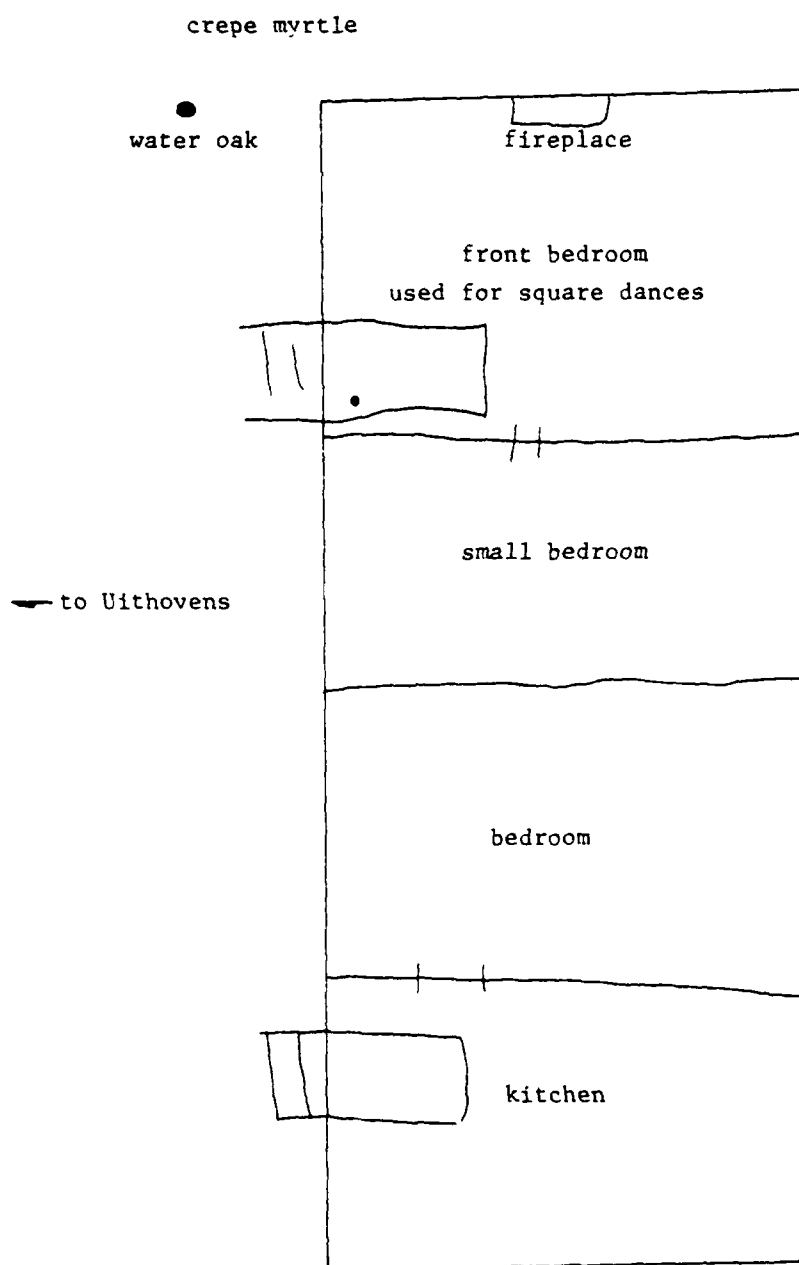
Floor plan of the Keller-Butts house. Drawing by Josie Kennedy. (original reduced by one-third)
